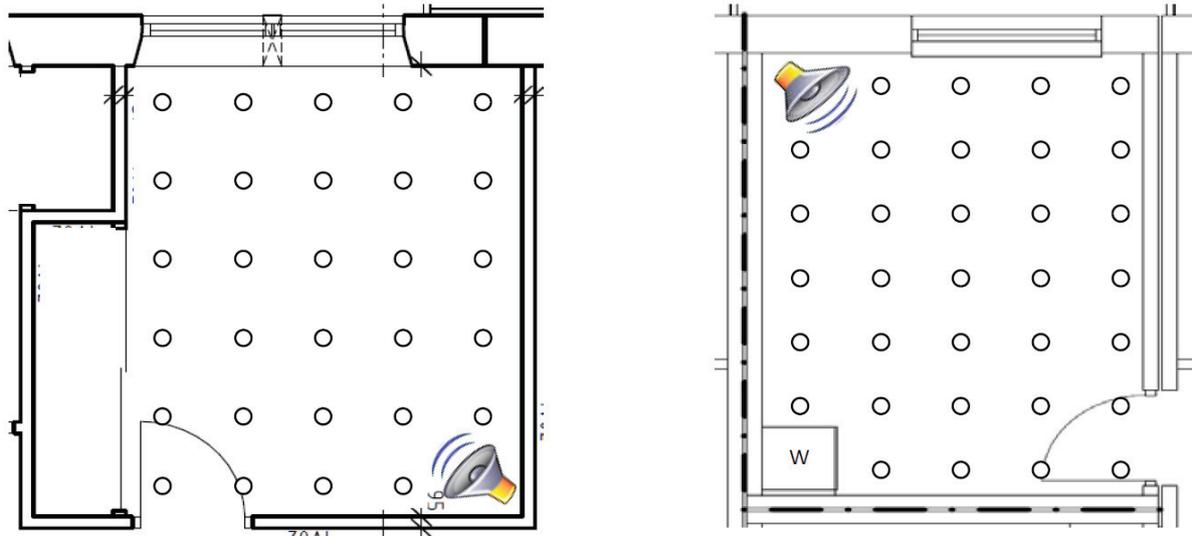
Layout of the two rooms. Microphone positions are shown for one out of four horizontal planes. The room with concrete construction is to the left and the wooden construction to the right.
